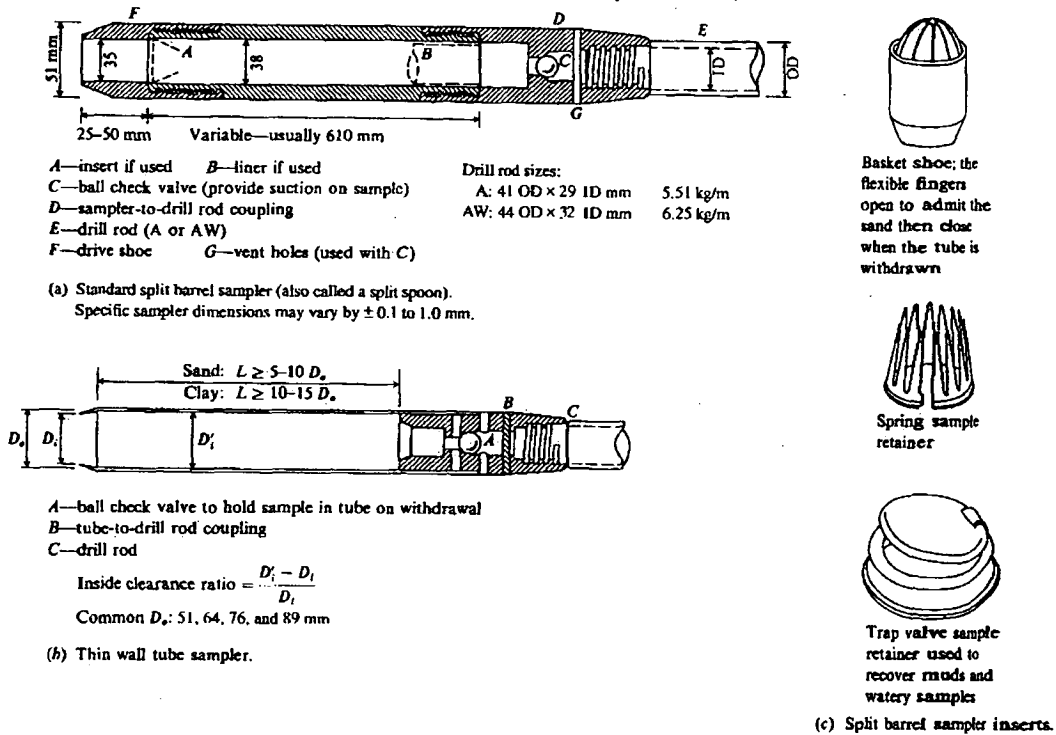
Commonly used in situ testing and sample recovery equipment, for both split barrel and thin wall tube (ASTM D 1586 and D 1587)
